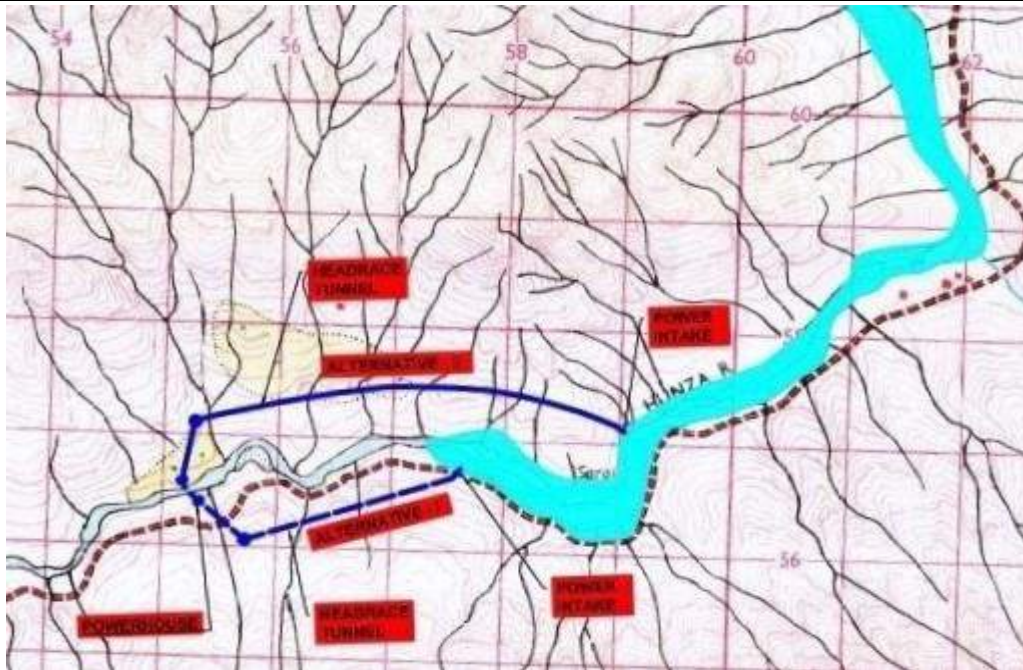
Alternative Project Layout on the Left and Right Bank
